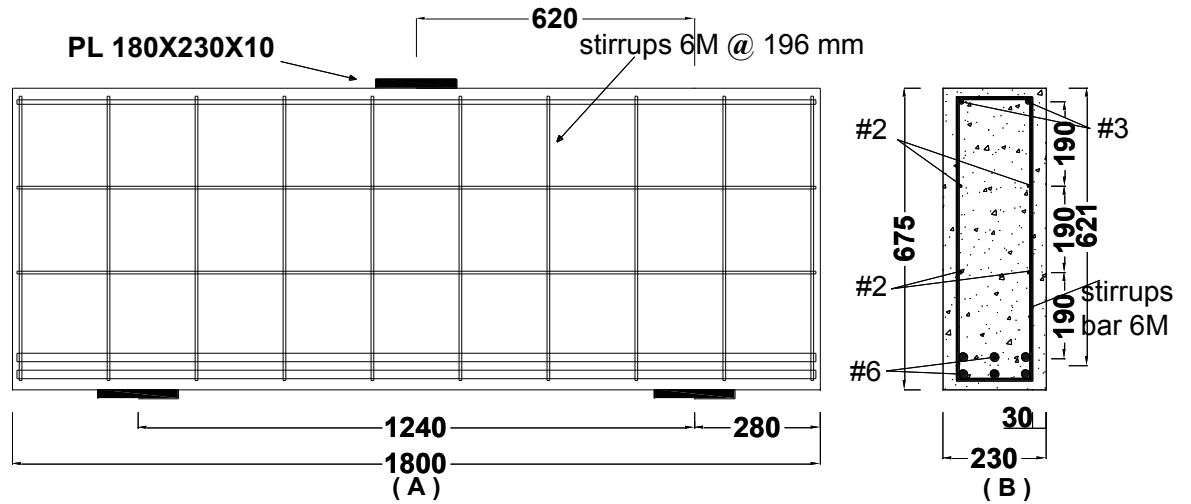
Beam A1/100: (A) elevation (B) cross section
